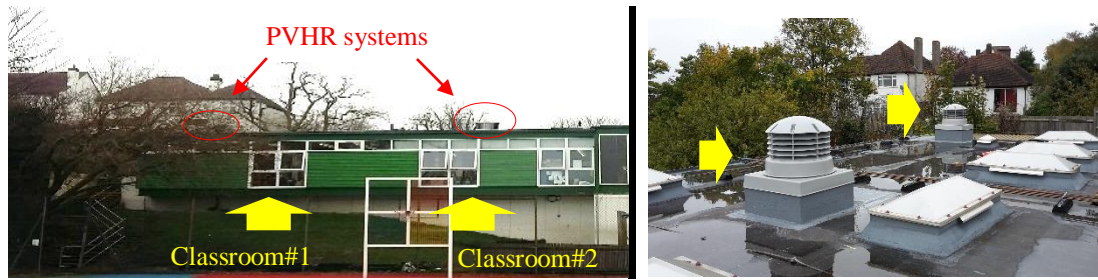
School's external North-West façade showing the classrooms in which monitoring took place (left), Roof cowls of the PVHR systems of the 2 classrooms (right)
